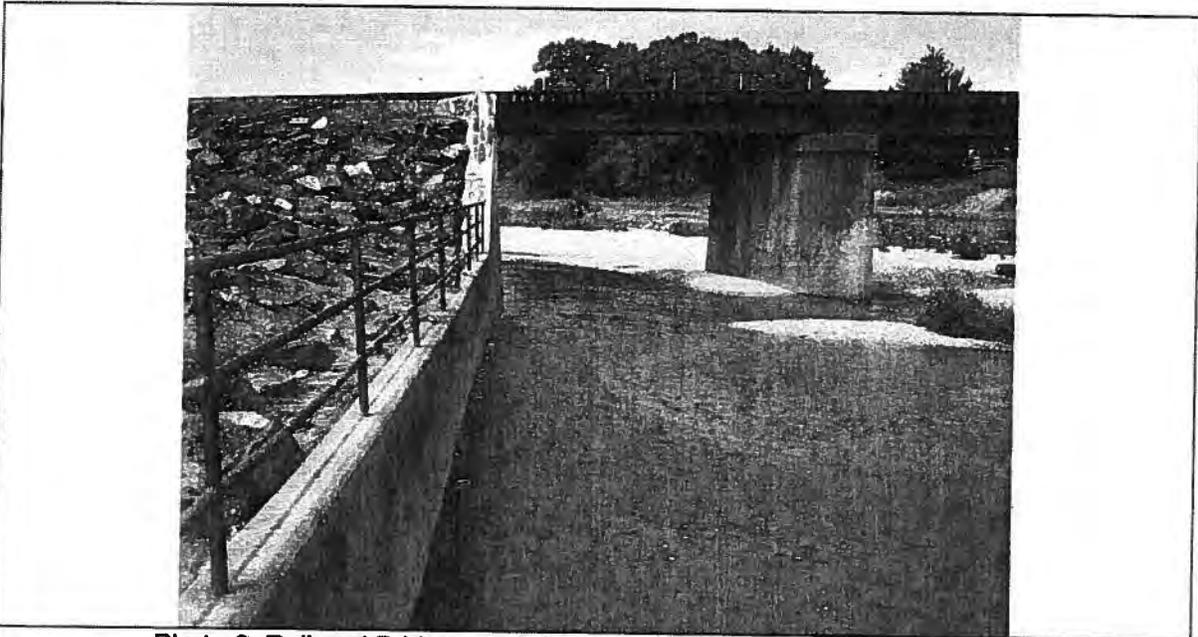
Railroad Bridge over East Fork of Anacostia River, STA 24+00.
